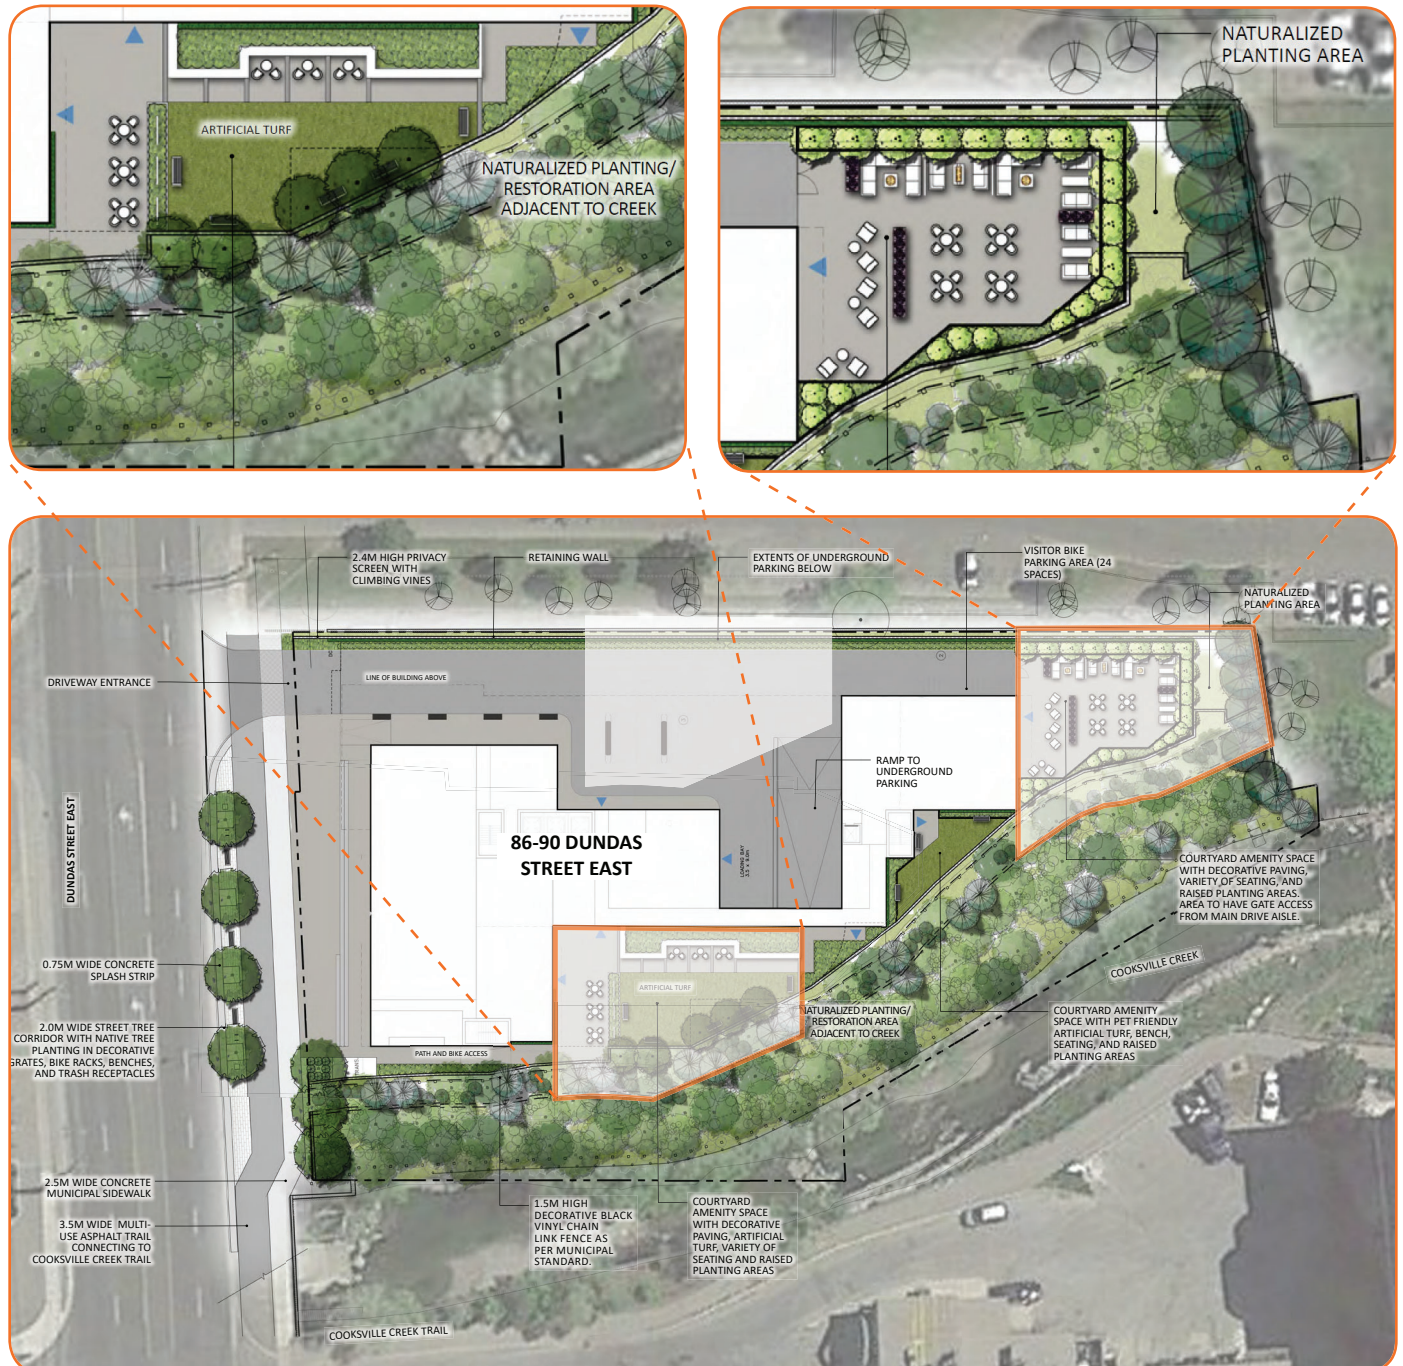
Landscape Plan: Prepared by Seferian Design Group.
